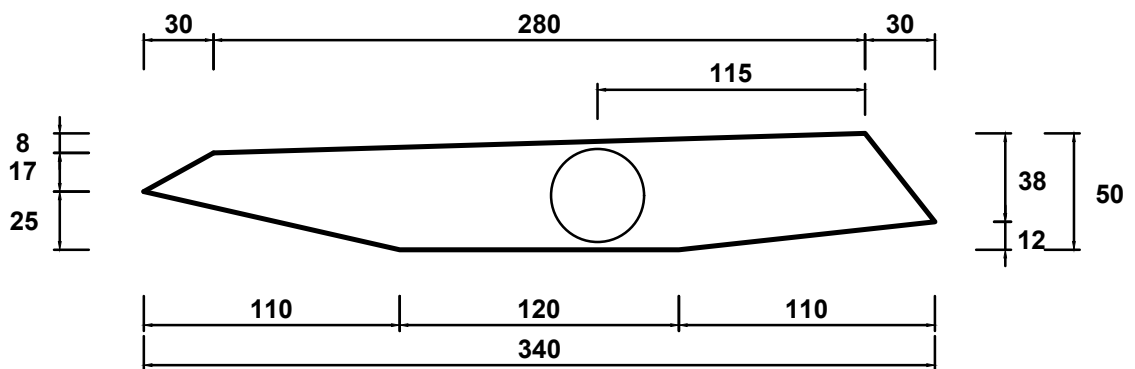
Detailed layout of section types with aluminium pipe and dimensions in 1:50.
